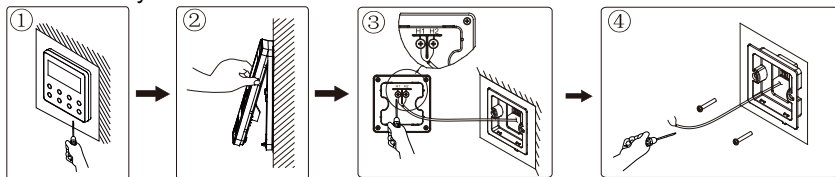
Sketch Map for Disassembly of Wired Controller
